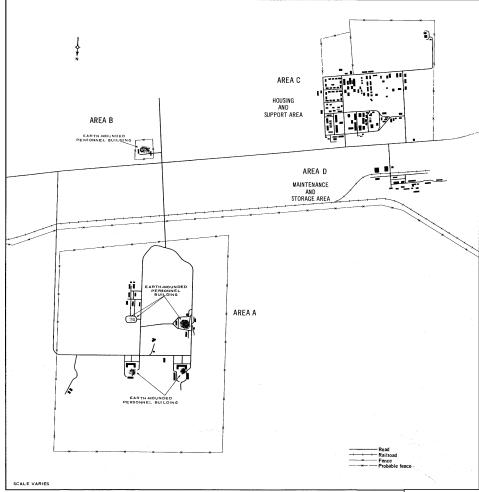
LAYOUT OF SHARAPOVO CENTRAL COMMAND CONTROL FACILITY.
